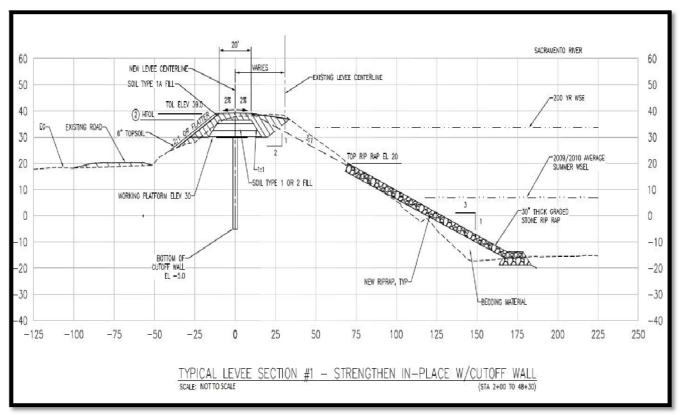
Typical Cross Section Strengthen In-Place with Cutoff wall
